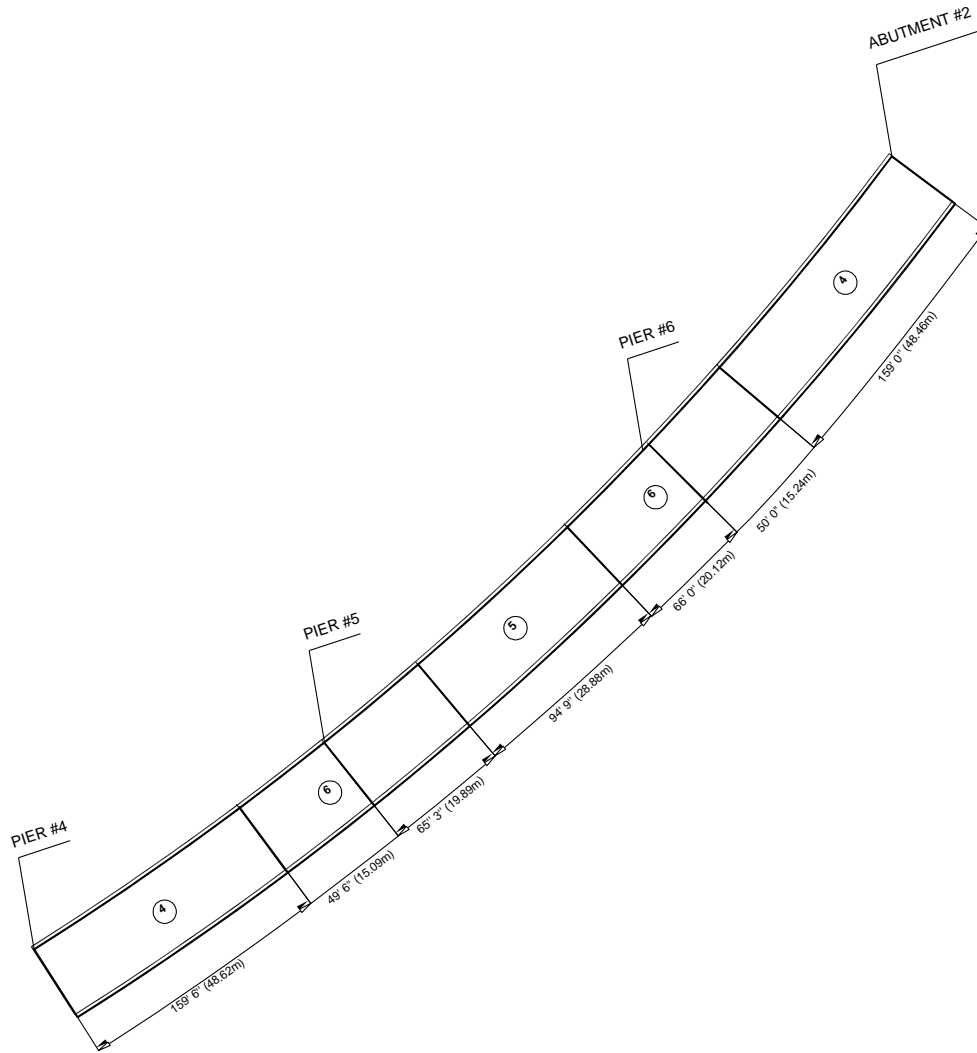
Unit 2 Deck Placement Sequence, Missing Ramps Bridge.
